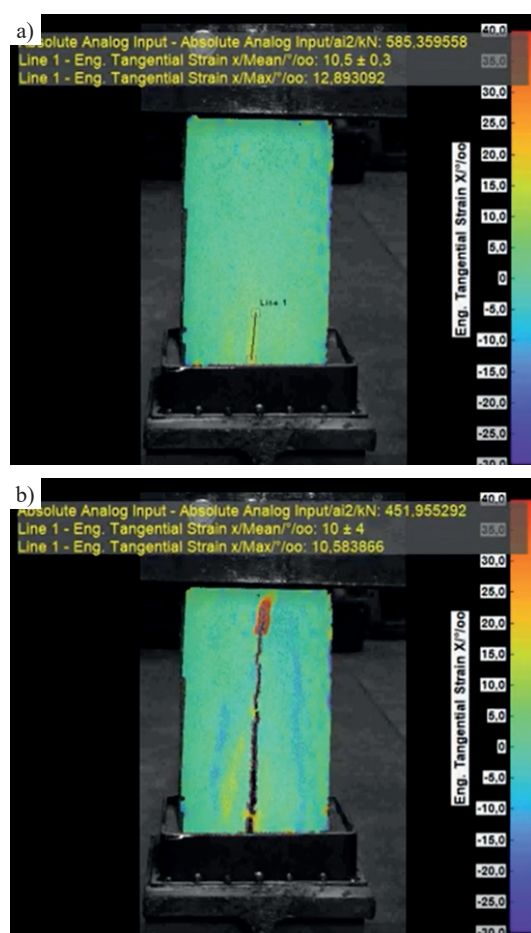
DIC measurement results for specimen 1K: a) before failure; b) after failure
